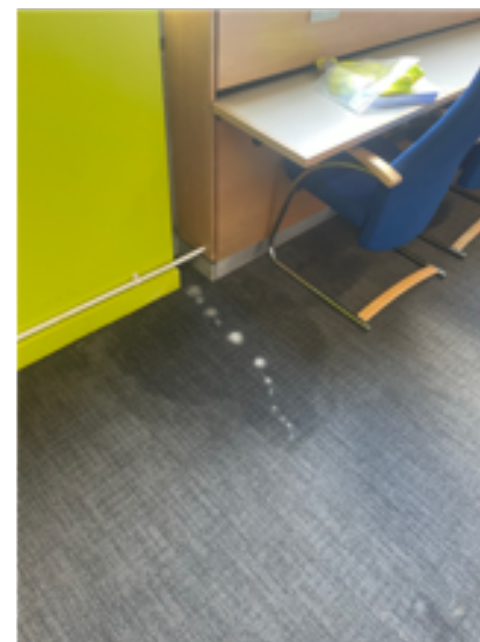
puddle forming below from water ingress causing damage to carpet tiles
